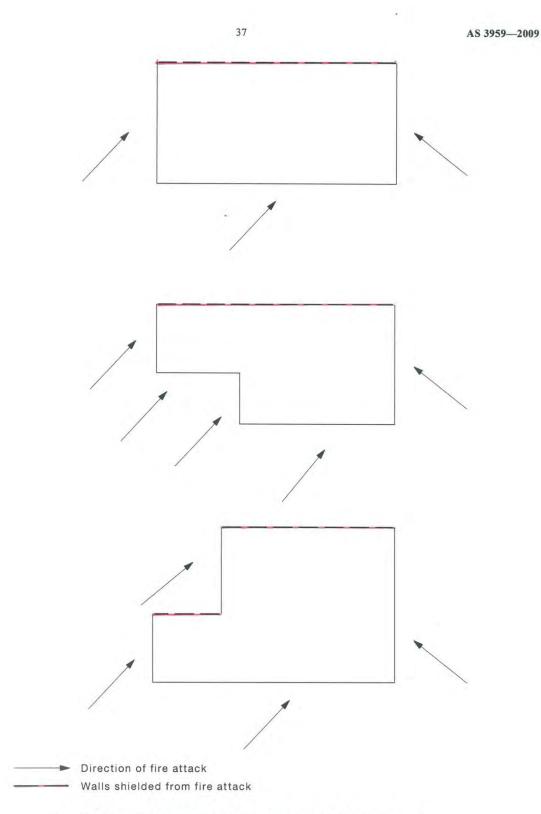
EXAMPLES OF WALLS SUBJECT TO SHIELDING
